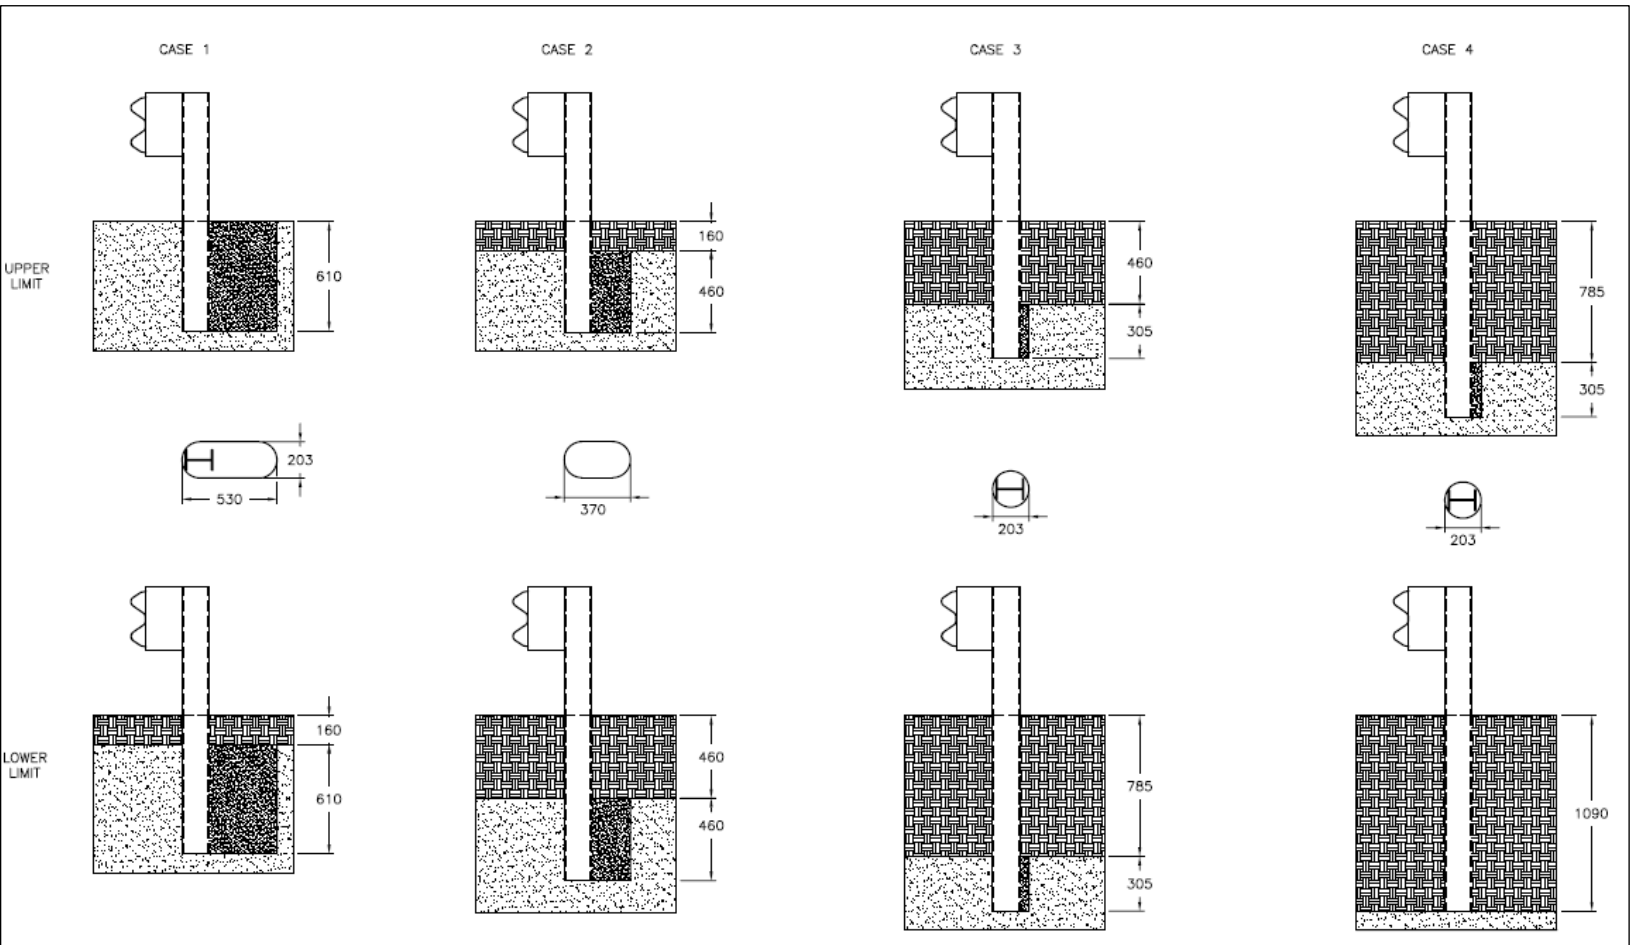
MwRSF's detailed guideline for post installation in rock (dimensions in mm).
